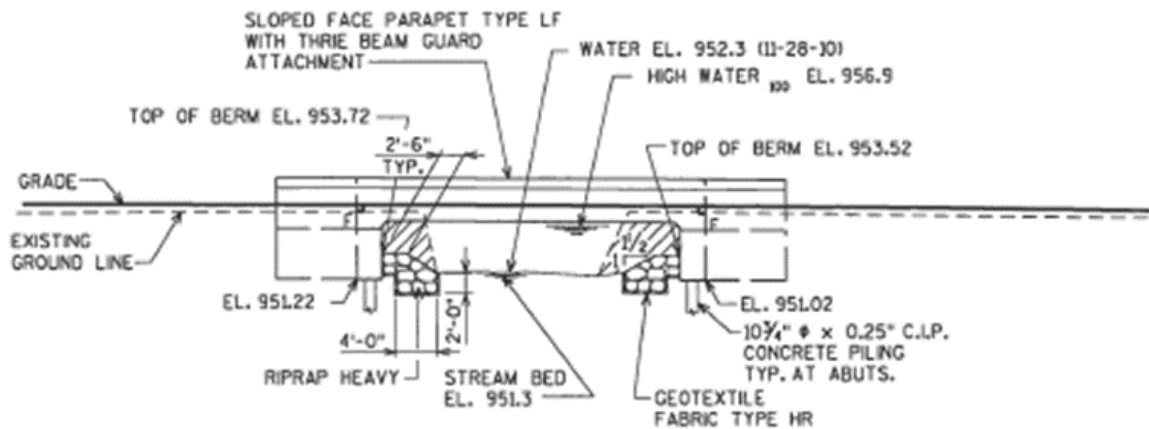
Slovak Valley Creek Bridge cross section (from project plans)
